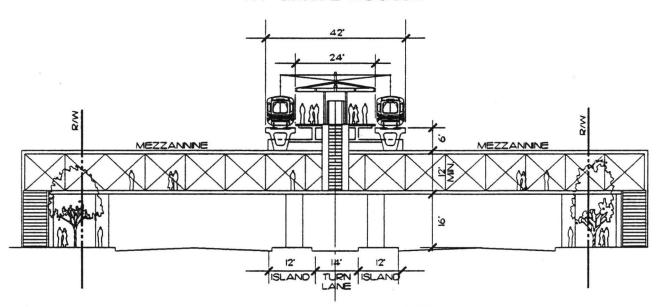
shows typical sections for aerial segments. The aerial structure would be supported on a single line of columns which would sit on islands in the roadway. For planning purposes, a 12' island with a 7' column has been considered, which is essentially equivalent to one roadway lane. This center-running alignment would be used, for example, on Crenshaw Boulevard from Pico to Exposition and from Stocker to Vernon; on Prairie Avenue from Century to 11th Street; and on Hawthorne Boulevard from Imperial Highway to El Segundo Boulevard. Section 5.8, Transportation Impact Analysis, describes in detail how this island could be accommodated on existing streets in the corridor.
